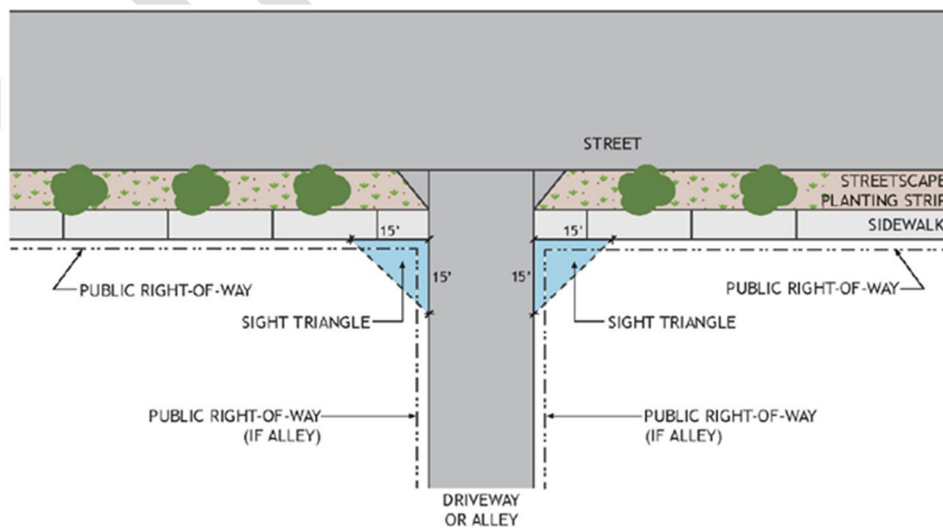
Sight Triangle Area at the Intersection of a Driveway or Alley and a Street with a sidewalk.
